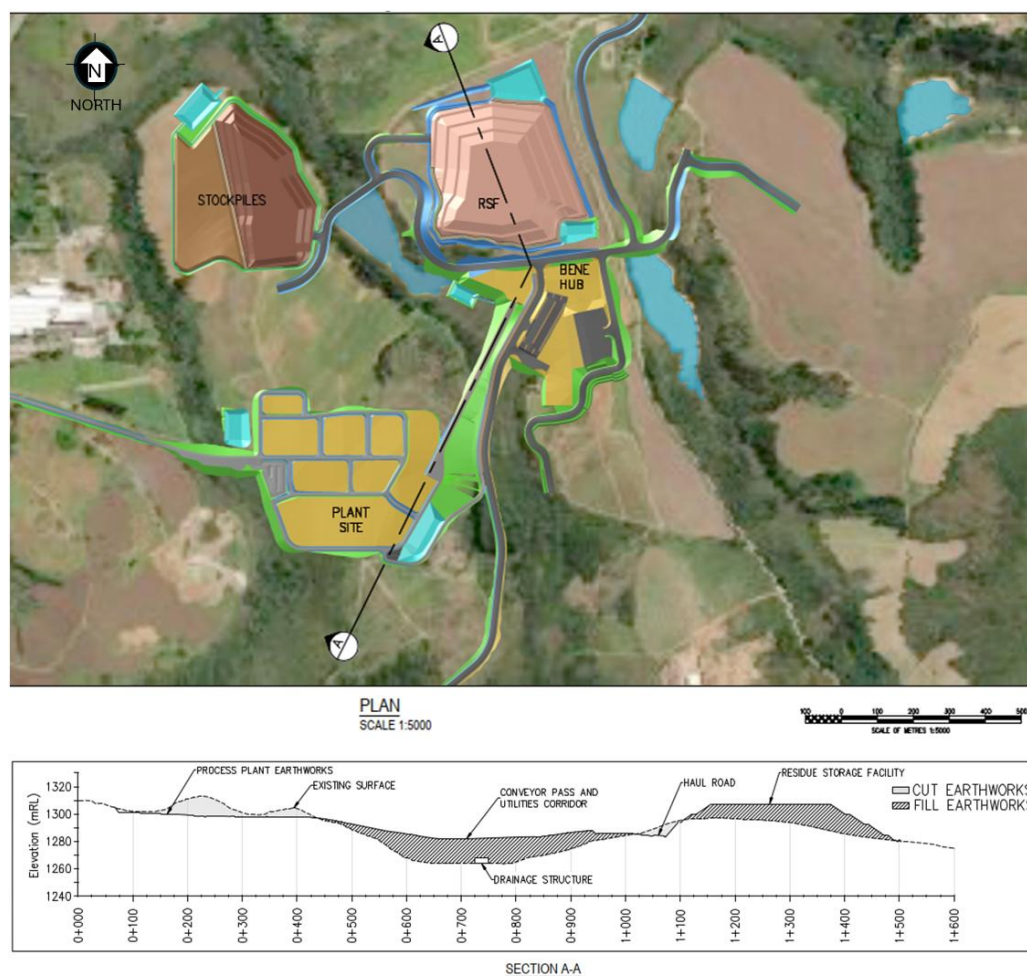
General site layout showing the plant site, beneficiation hub, residue handling infrastructure, haul roads and supporting project facilities. Existing and proposed elevations are shown.
